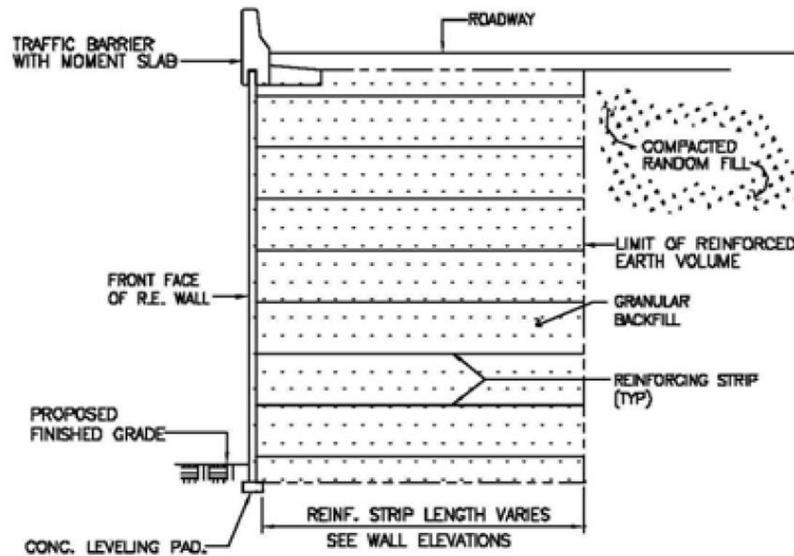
71 Typical Mechanically Stabilized Earth Systems (MSE) Wall Details [13].
